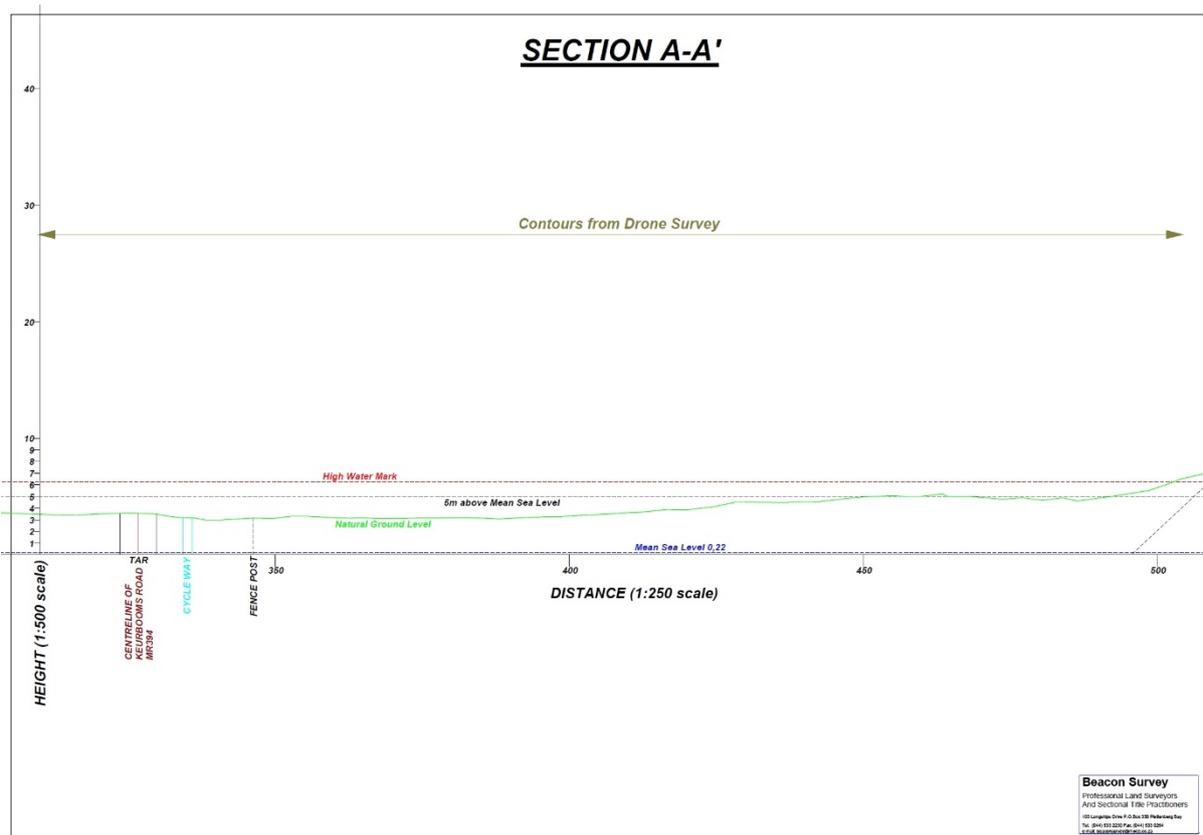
Cross-section through part of the proposed development site (south is on the left, north on the right).
